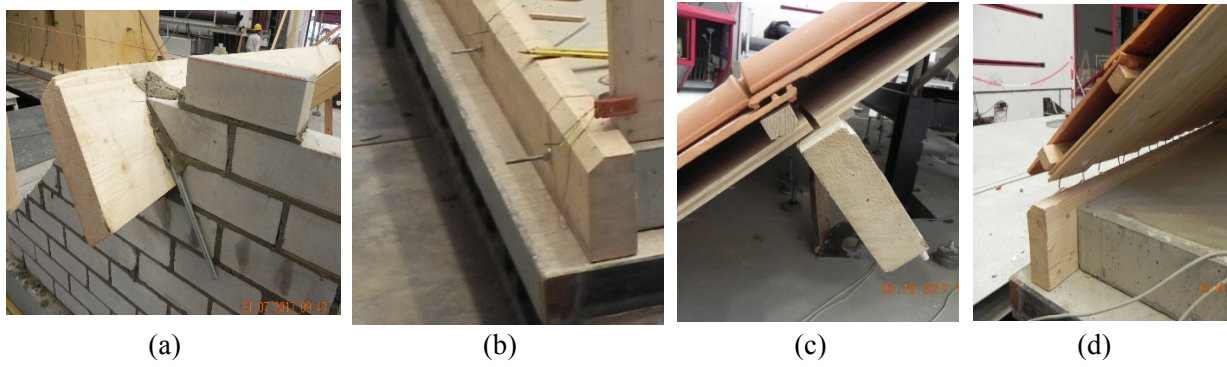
L-shaped anchors (a), RC slab/beam connection (b), pure frictional contact between walls and planks (c) and nailed connections between boards and ridge/timber plate (d) (Correia et al., 2017)
